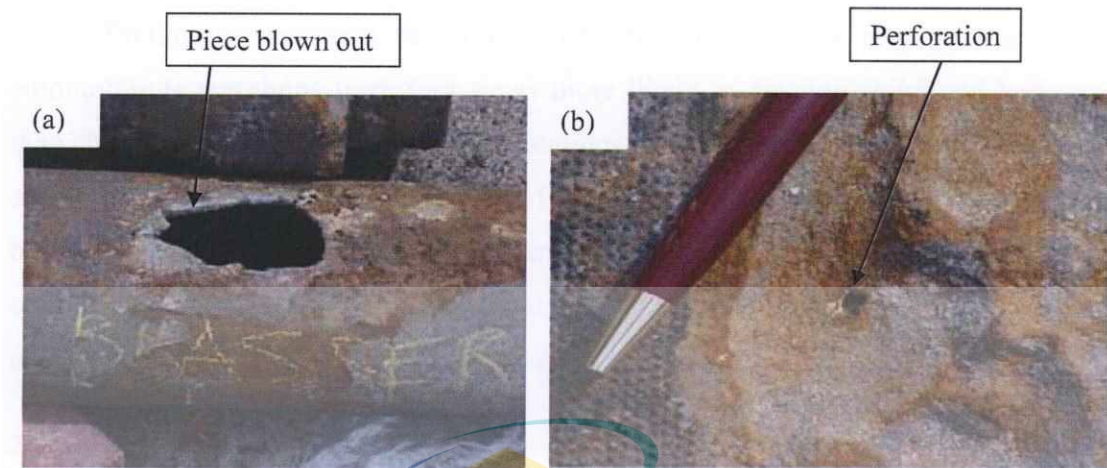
Type of Pipe Failure (a) Piece Blown Out and (b) Perforation
